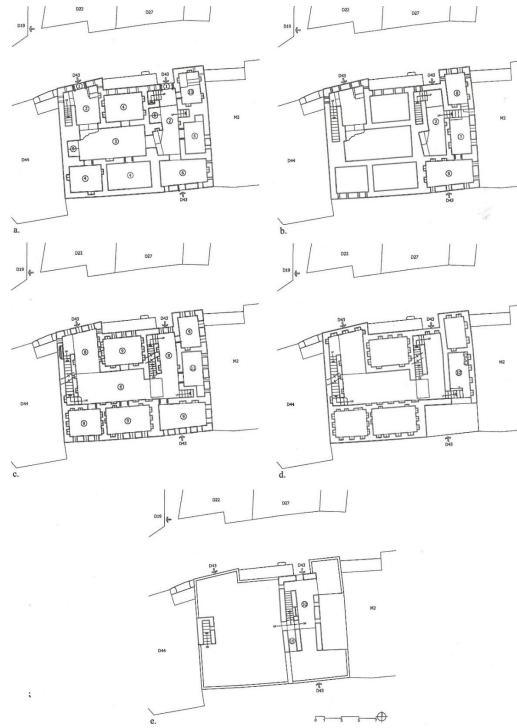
Floor plans of dwelling SD43; a. Ground floor; b. First mezzanine floor; c. First floor; d. Second mezzanine floor; e. Third floor and roof; 1. main entrance door; 2. First *dahrīz*; 3. Second *dahrīz*; 4. *suffah*; 5. *caqad*; 6. *darss*; 8. *carshah*; 9.*gurafah*; 10. Overhead shade; 11. Kitchen store; 12. Kitchen; 13. Falaj bath; 16. Sky light.
